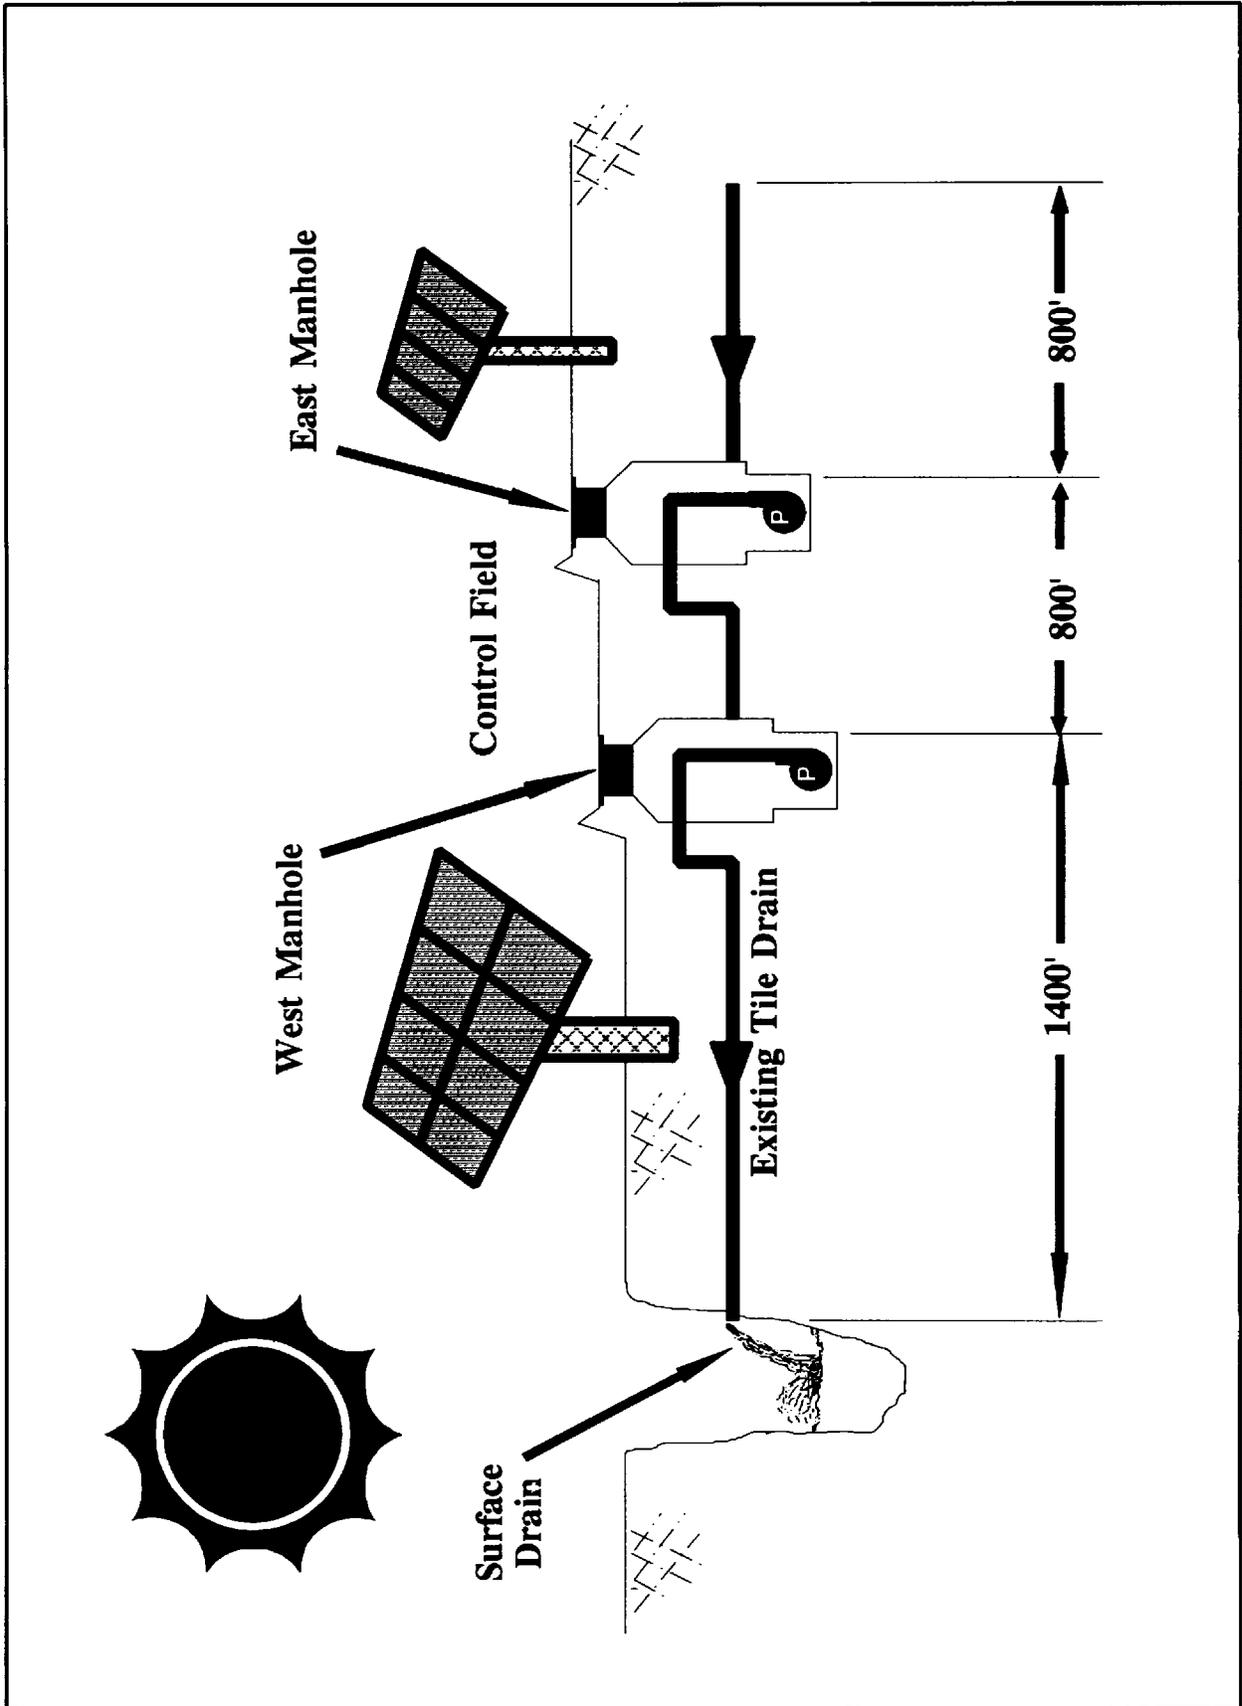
PV pumping system and manholes installed in existing tile drain.
